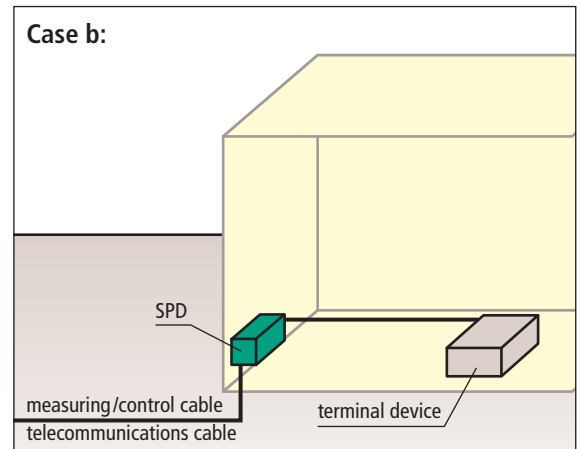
Building without external lightning protection system and cables installed between buildings
